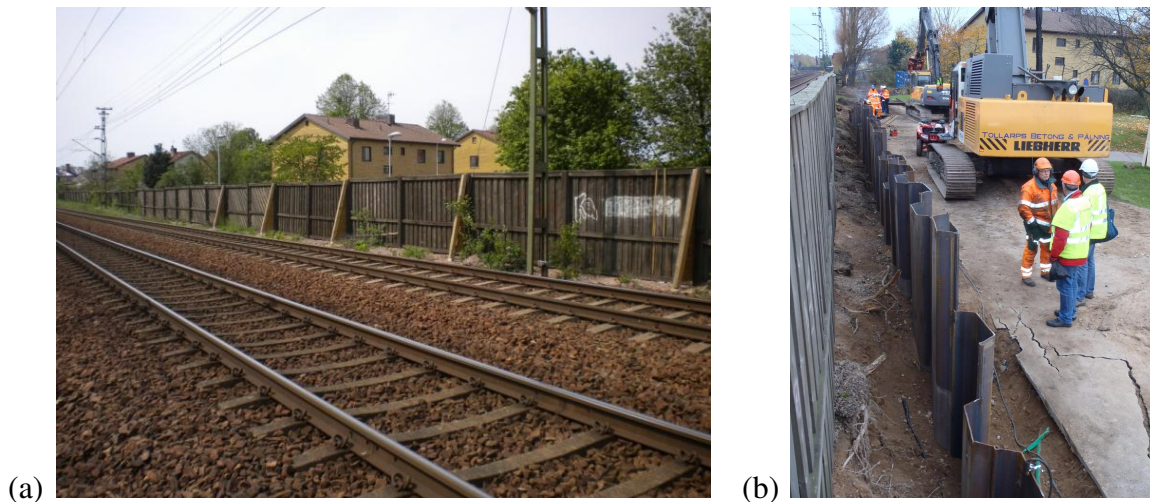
Site of Furet: (a) track, noise barrier and buildings close to the track, and (b) installation of the sheet piling wall.
